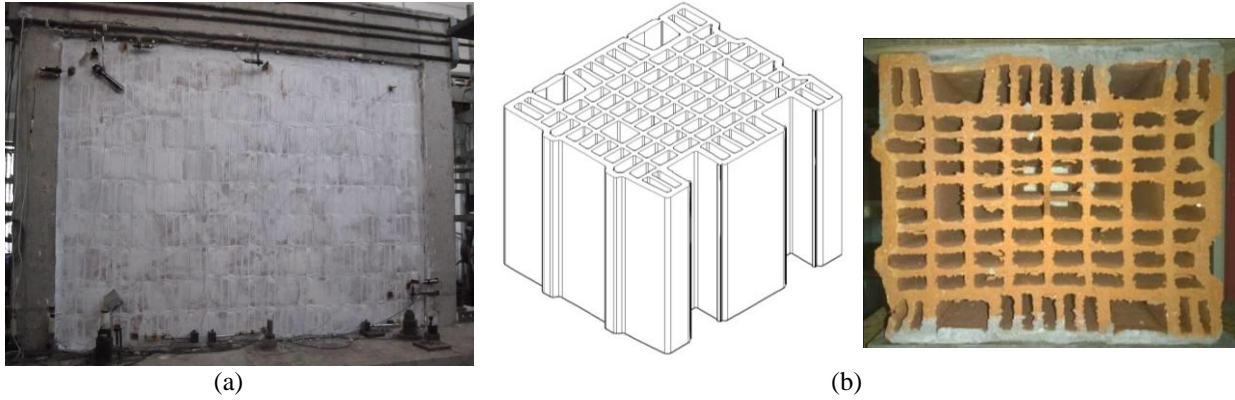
(a) Infill wall constructed using the new brick (INSYSTEM 2) for in-plane loading, (b) Innovative Brick unit.
